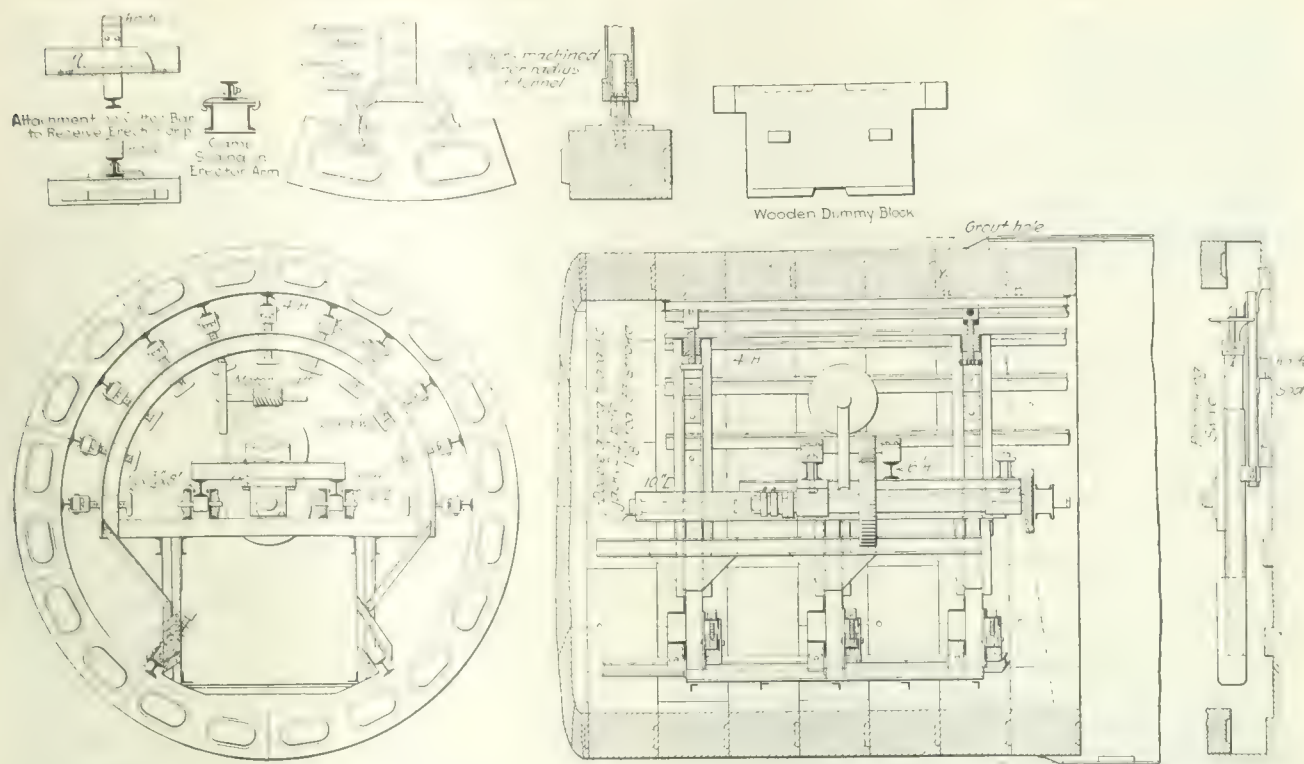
NEW TRAVELING PLATFORM AND OTHER IMPROVED DETAILS FOR CONCRETE-BLOCK TUNNELING
